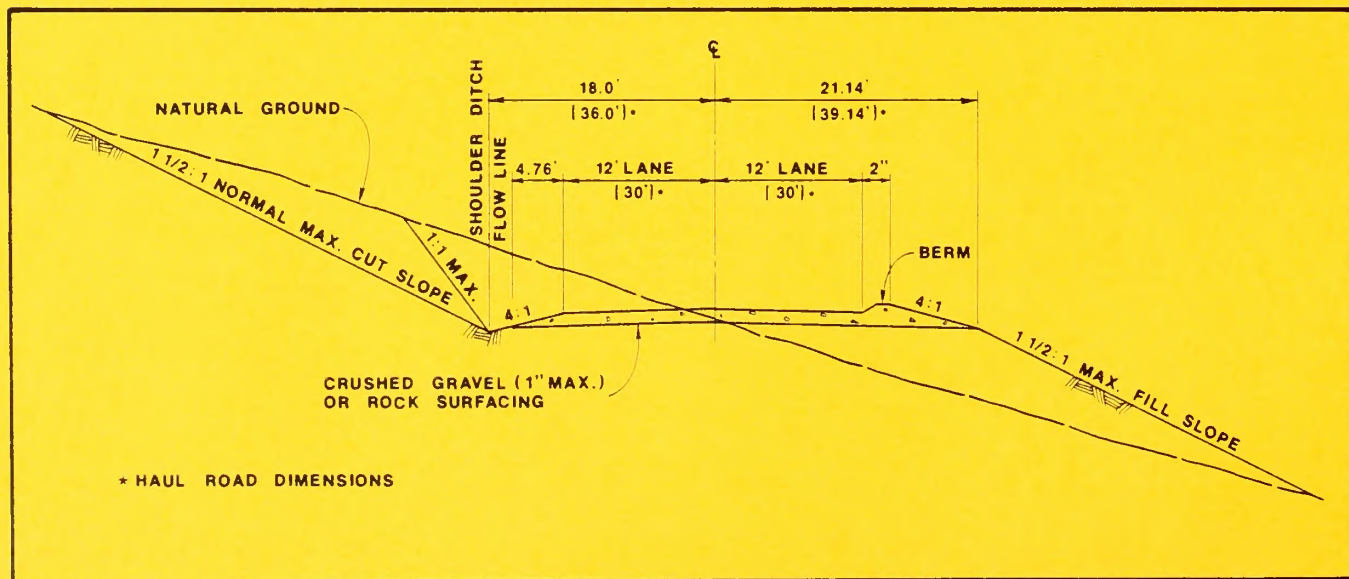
Typical Section of Road Where Natural Ground Slopes are Steeper Than 4:1
